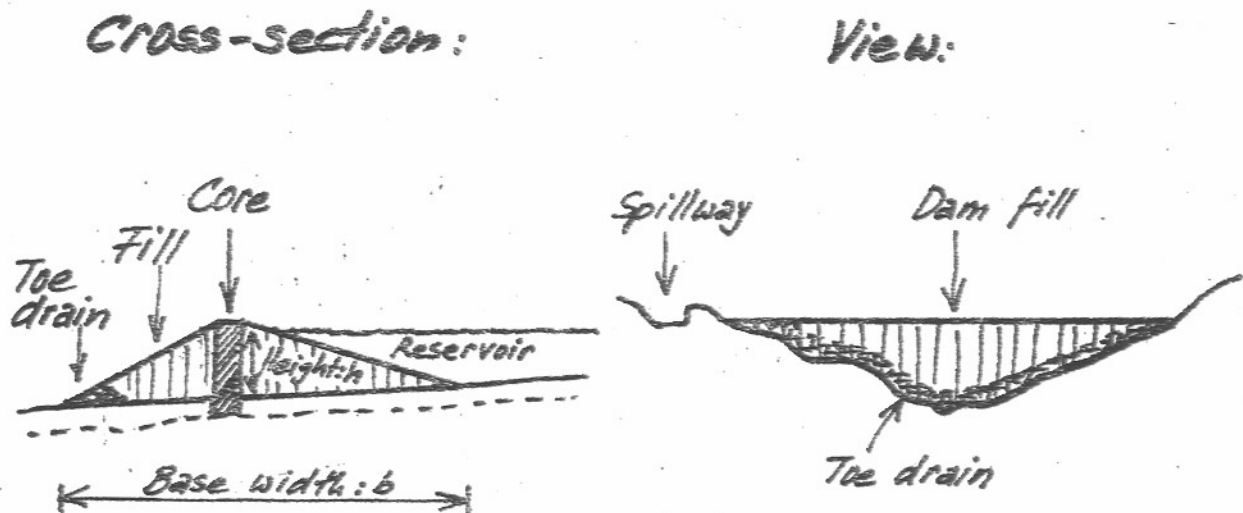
Cross-section and front view of a typical small-scale earth microdam showing its elements.
